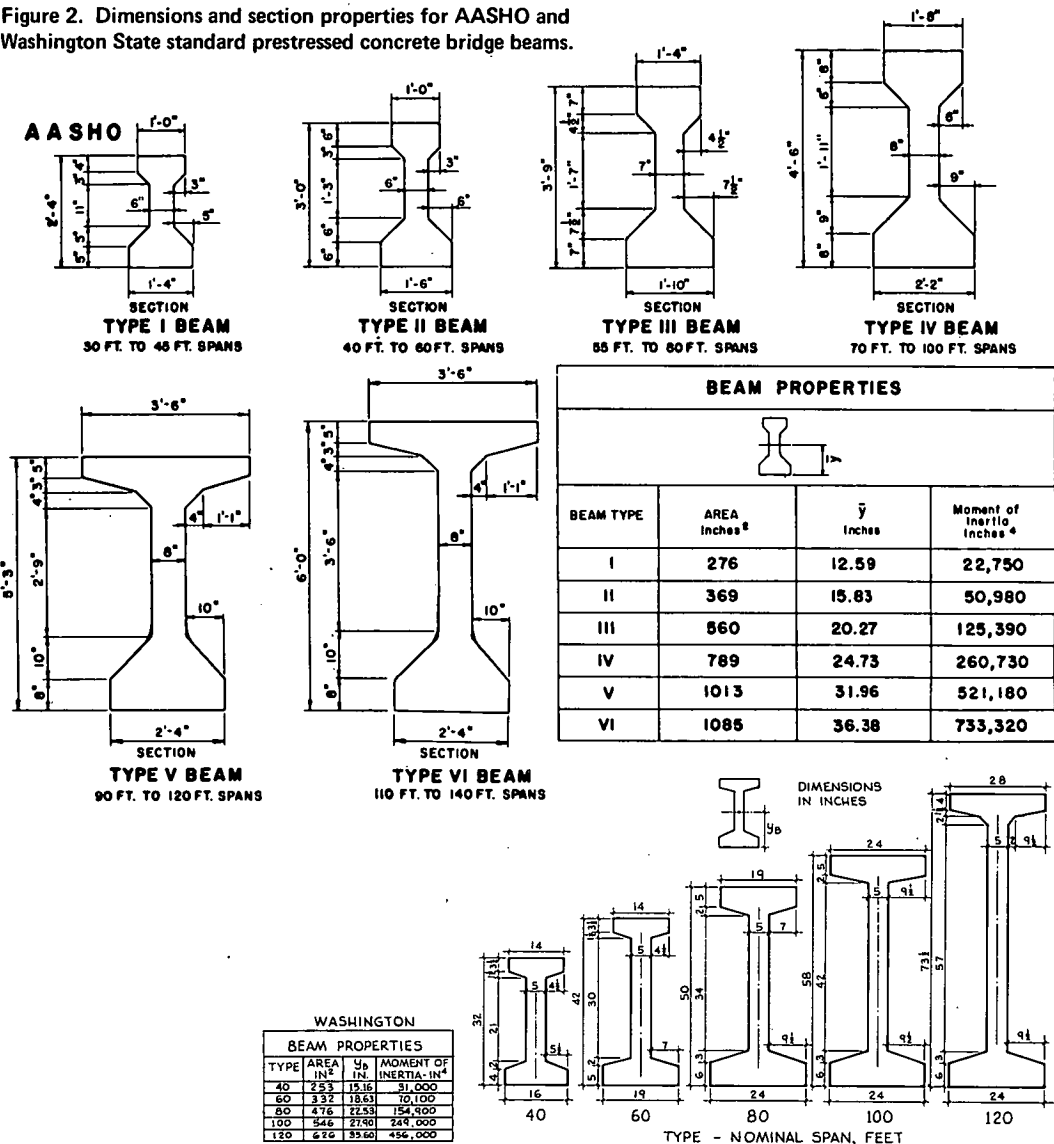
Dimensions and section properties for AASHTO and Washington State standard prestressed concrete bridge beams.
